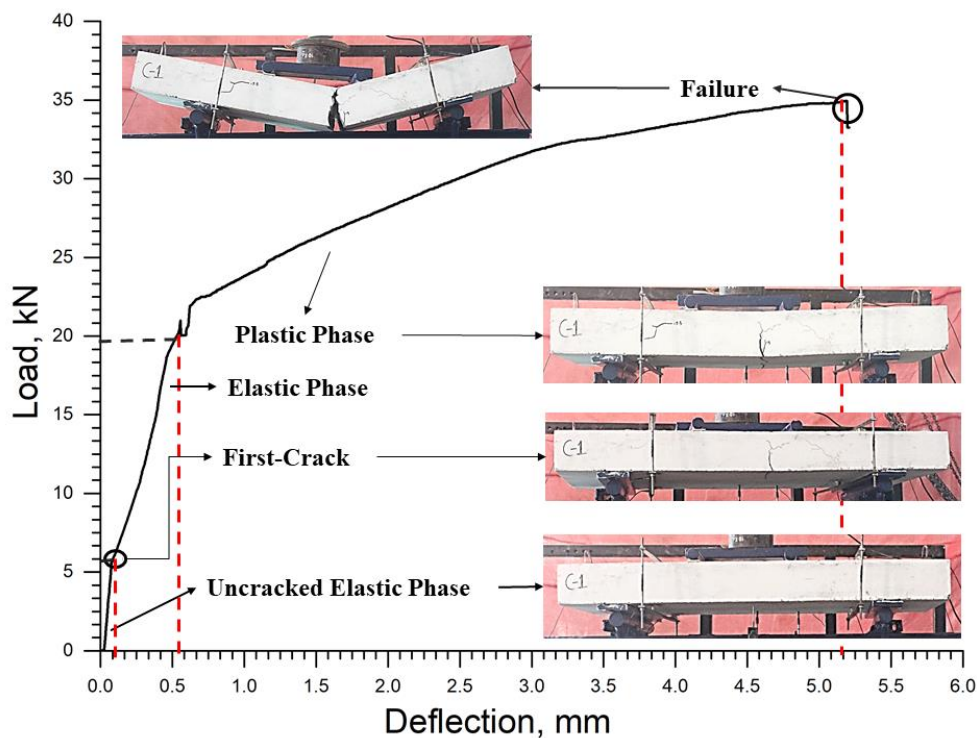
Load deflection curve of control EPS sandwiched concrete panels
